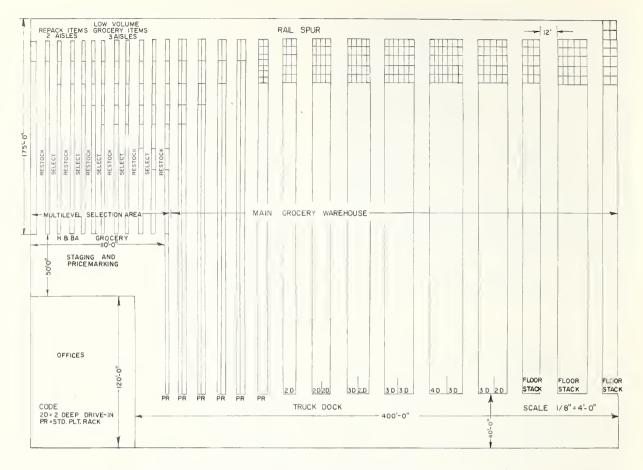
Warehouse layout showing separate area for a multilevel operation.
